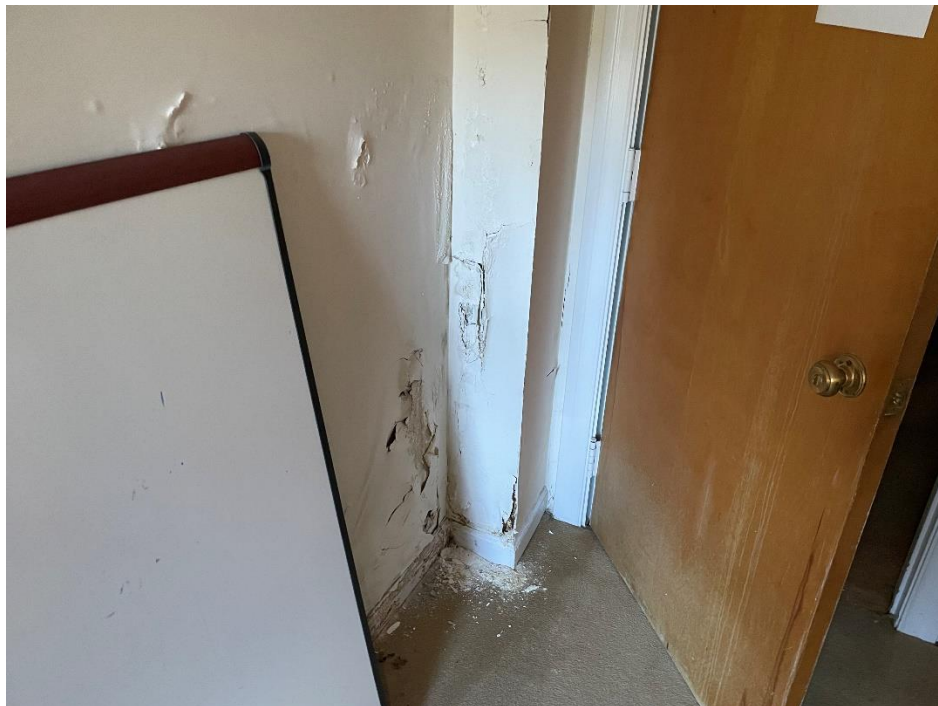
View of the water damage at second floor conference room, where the east wing abuts the original structure.
